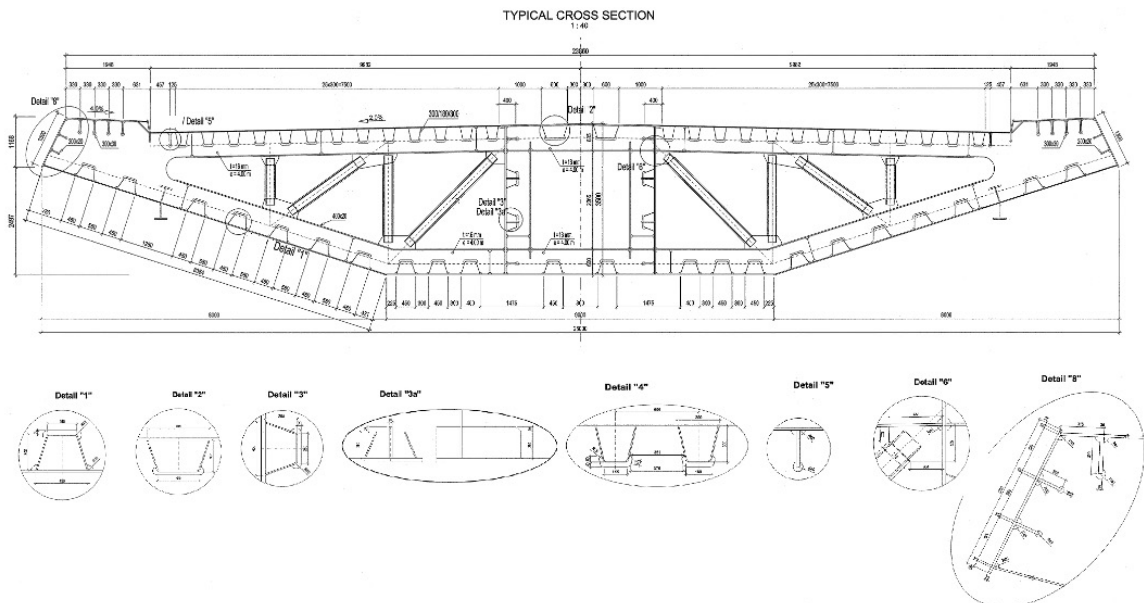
Details of cross-section of main span of New K m rhan Bridge.
